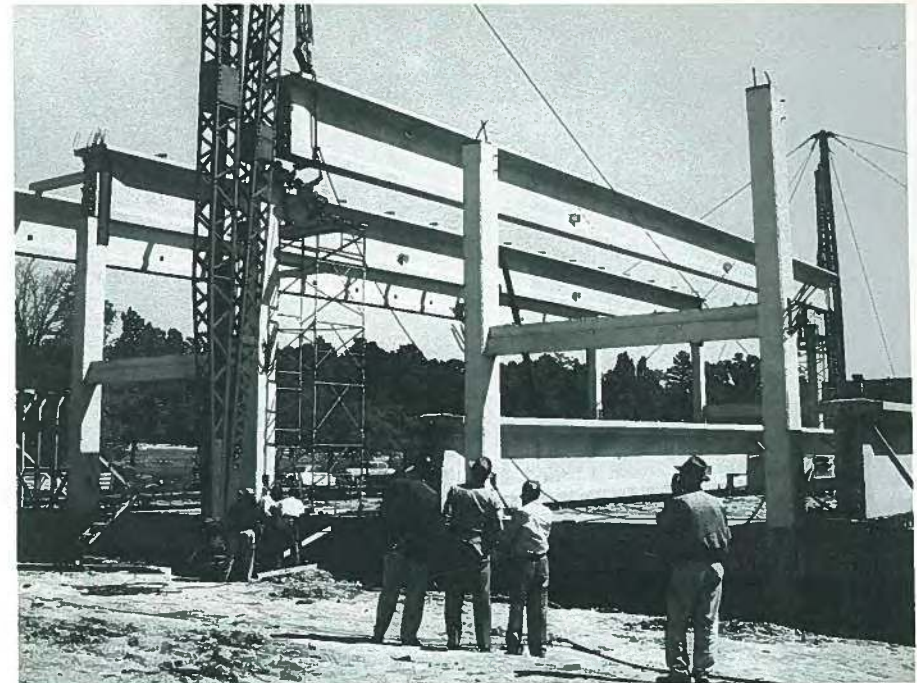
Girder No. 3 almost in position over columns. The column cables are being pulled up in order to thread them through holes in the girder ends.
